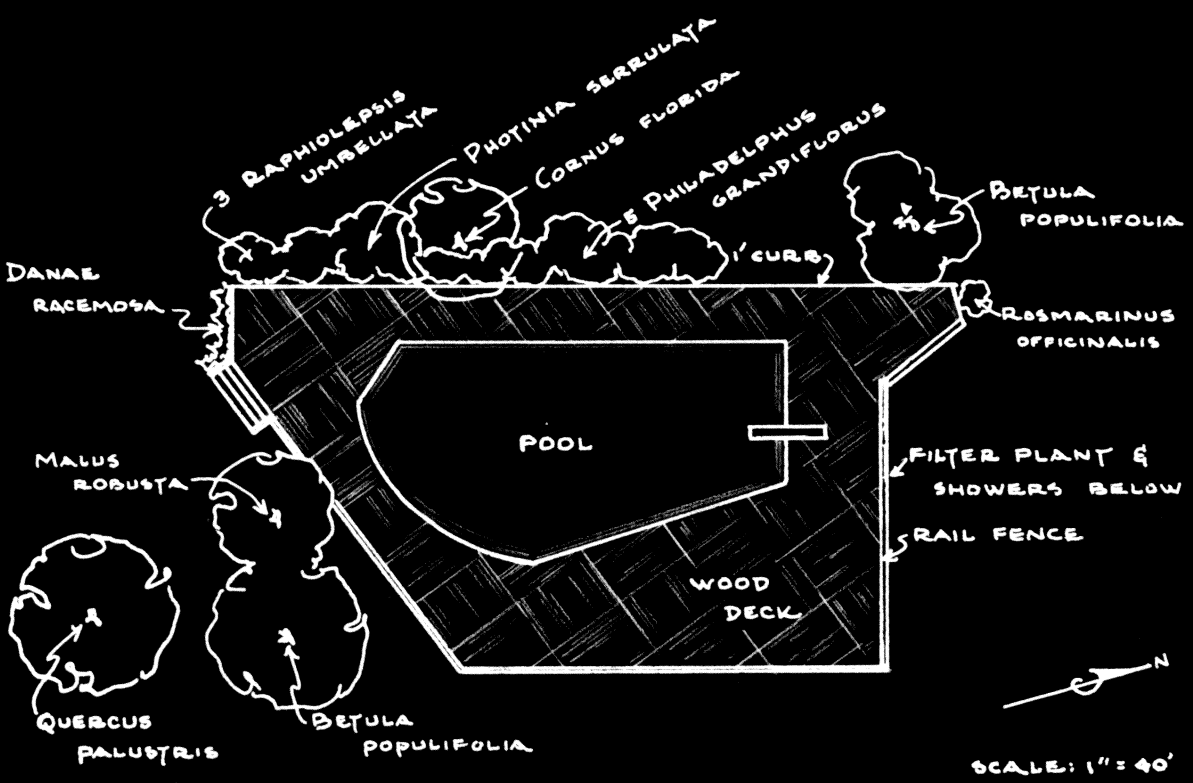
Border Planting Around Recreation Area, and Pool Detail
